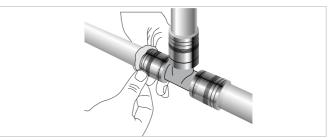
Filling the gaps between fitting and pipe with mastique
